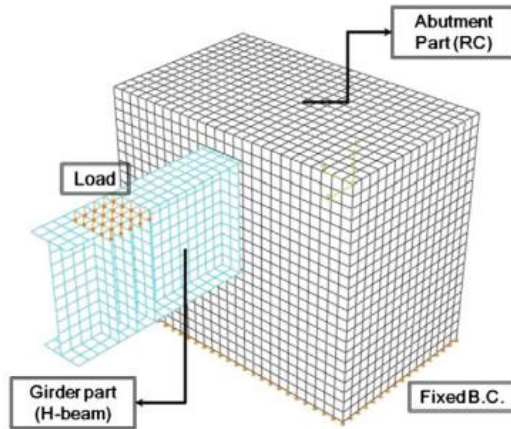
Finite element model of steel girder-abutment joint specimen.* (Kim, Yoon, Kim, Choi, & Ahn, 2011)
